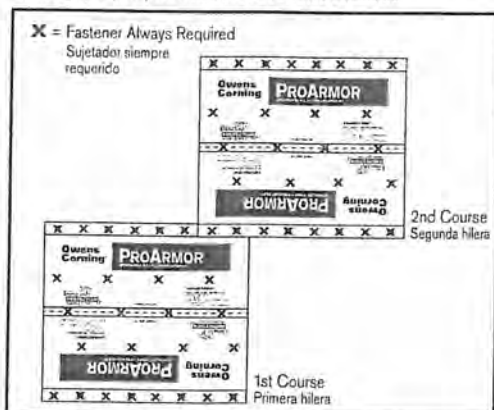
Minimum Fastening Locations for Same Day Coverage Using Roofing Nails, Pneumatic Nail Guns or Cap Nails Fig 1.
